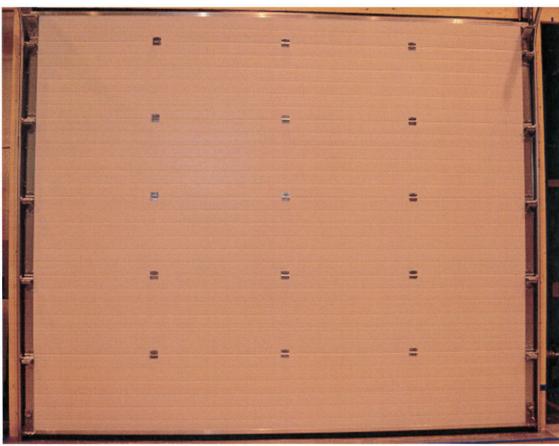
Tested door, DOCO Industrial door with Tecsedo panels, mounted in the test rig, as seen from inside.
